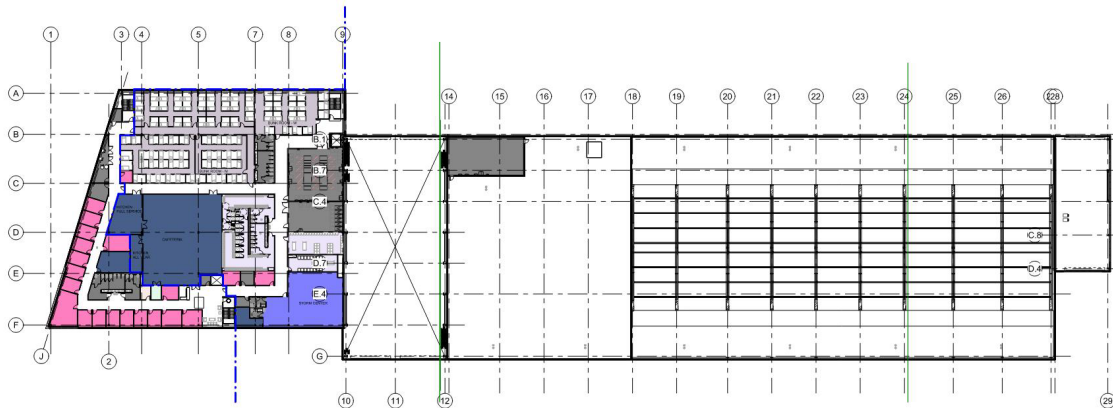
Large Vehicle Storage & Maintenance Facility first floor partial plan is provided to illustrate a more detailed view of the current layout of the various functions served inside the non-equipment spaces.
